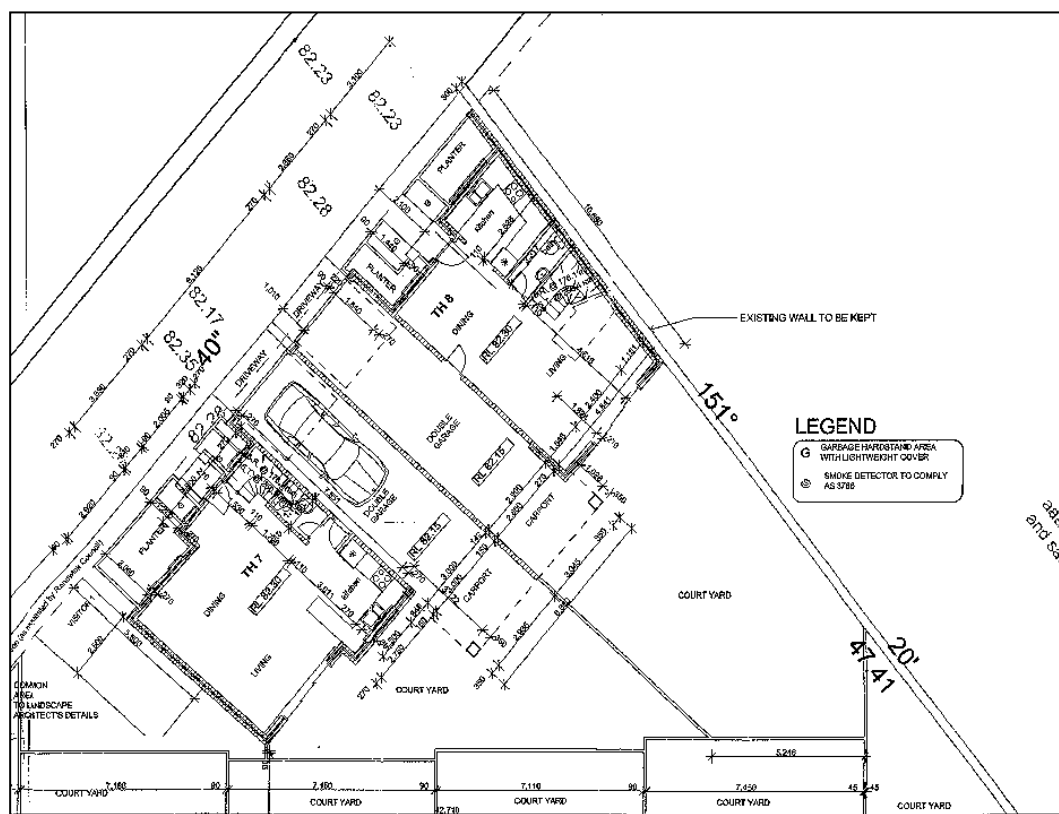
Extract of approved DA/560/2002/B ground floor plan
